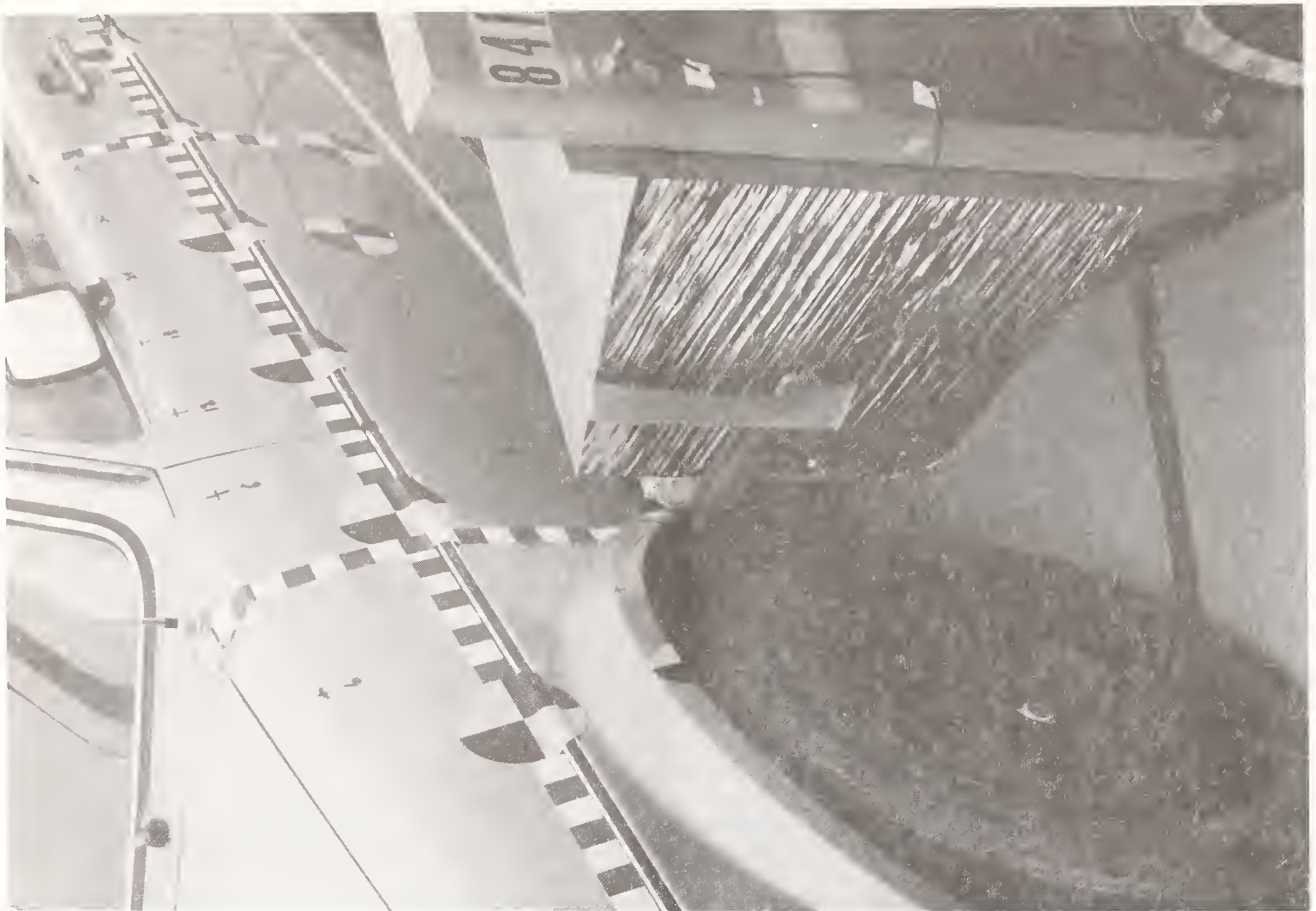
PRE-TEST CLOSEUP - VIEW 1
